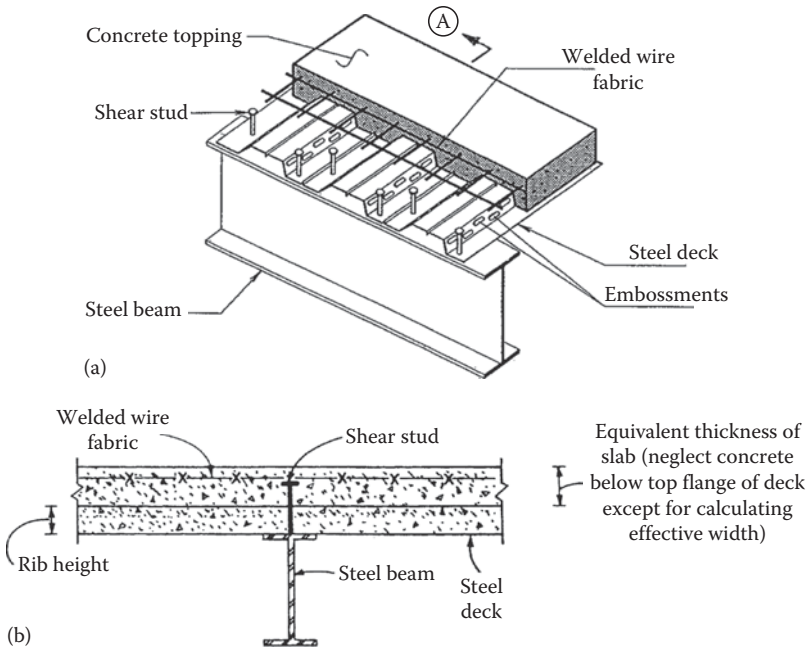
Components of composite floor system: (a) schematics showing steel deck perpendicular to beam; (b) section.
